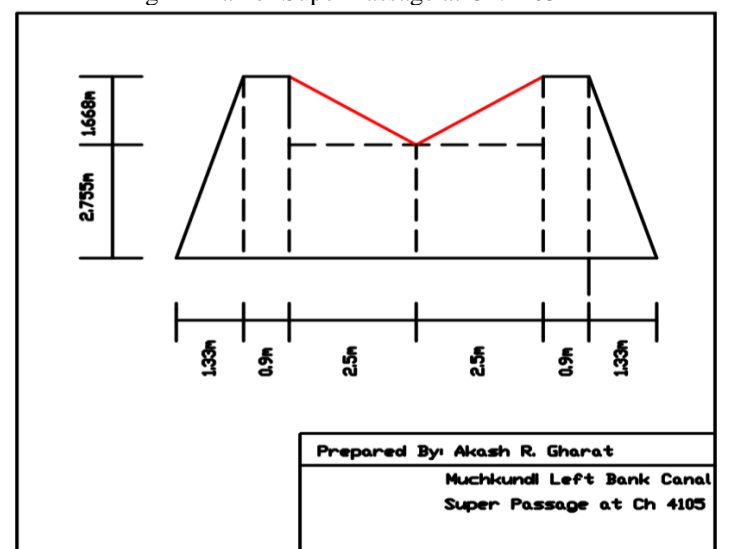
Elevation of Main Structure of Super Passage at Ch.4105
